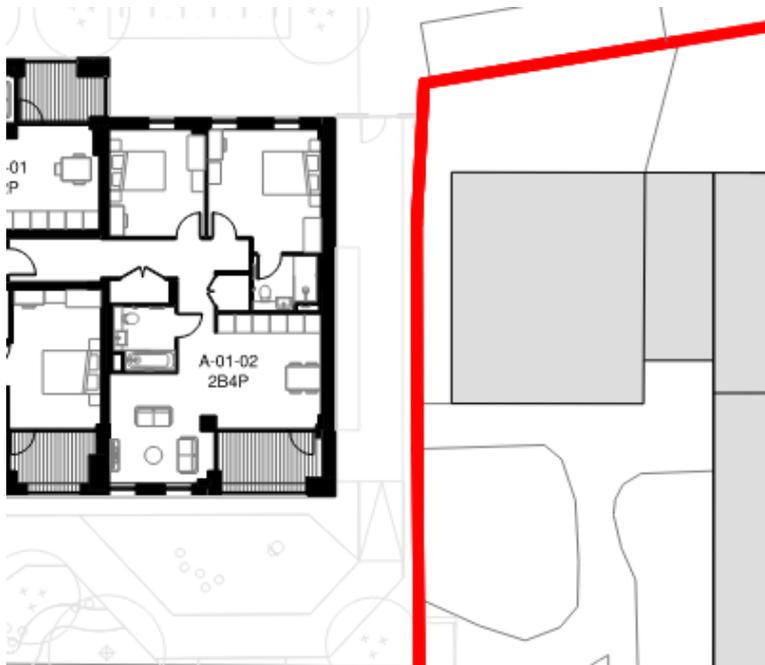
Partial third floor plan showing terraces with set back balustrades
